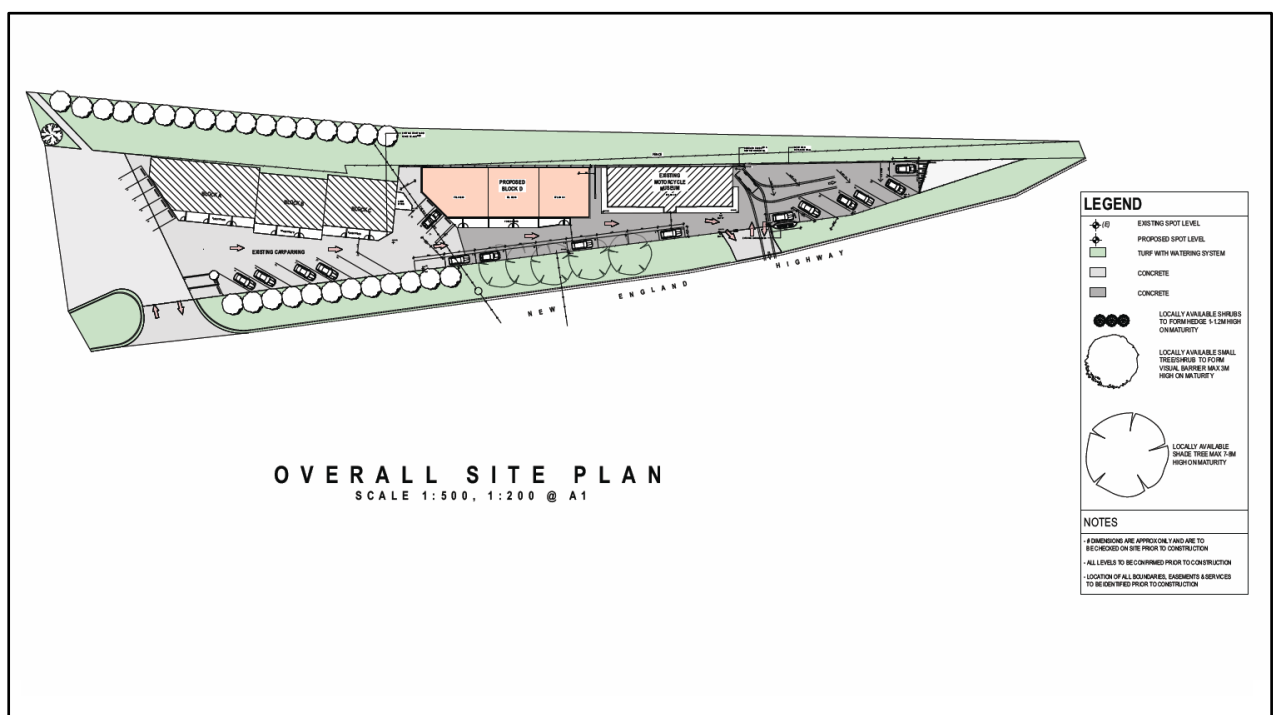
SITE PLAN OF THE PROPOSED SERVICED APARTMENTS
